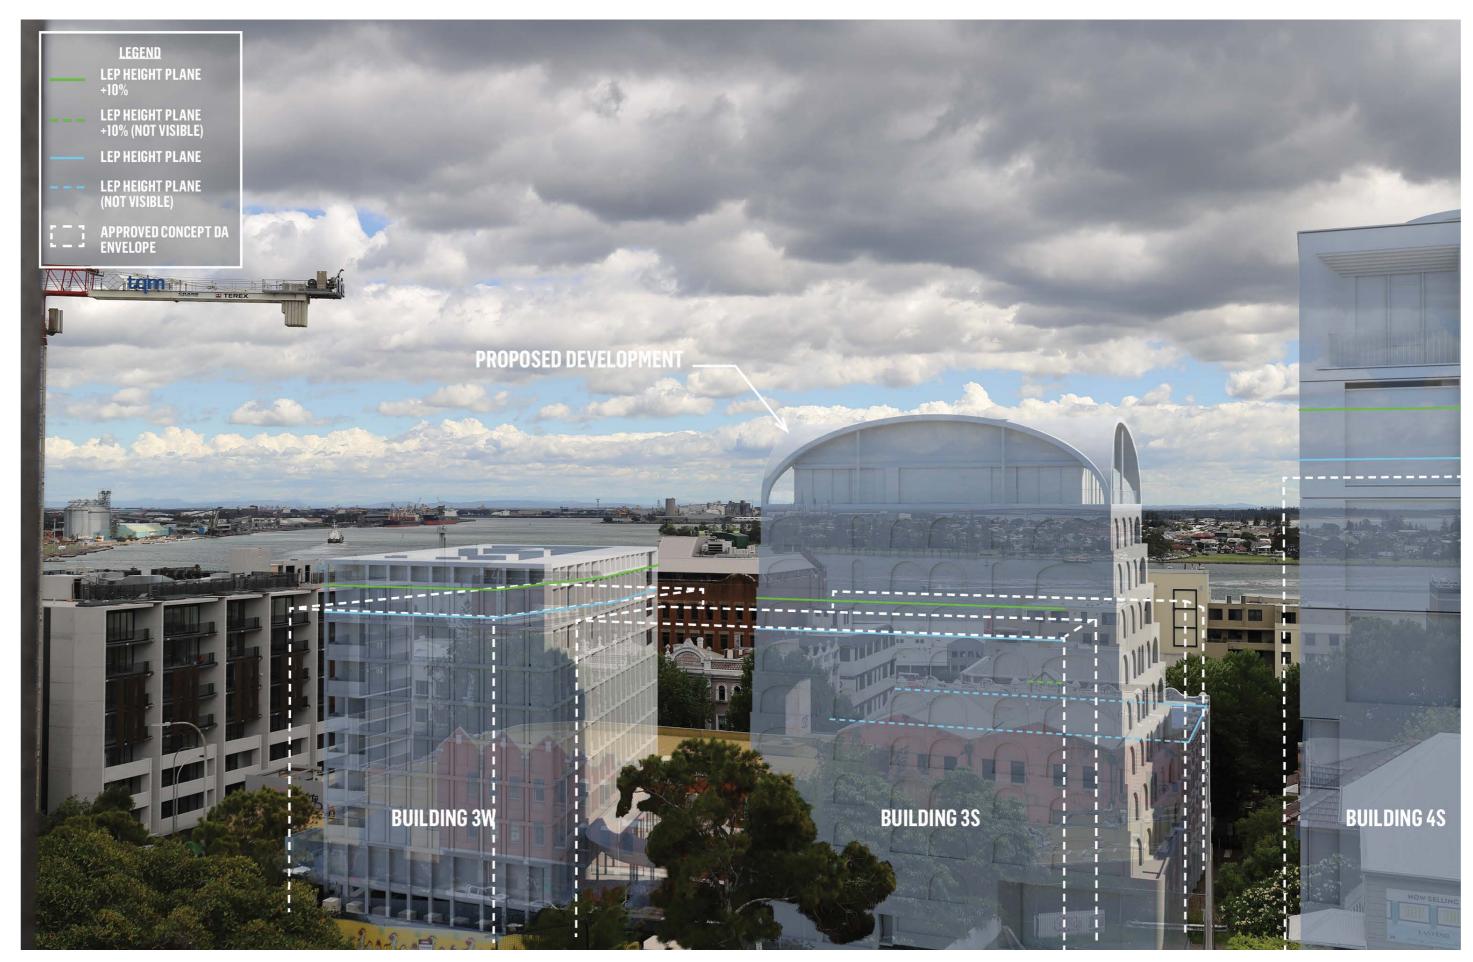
Proposed view north-north-west, from west end mid-level (adjacent 1st floor) garden terrace.
